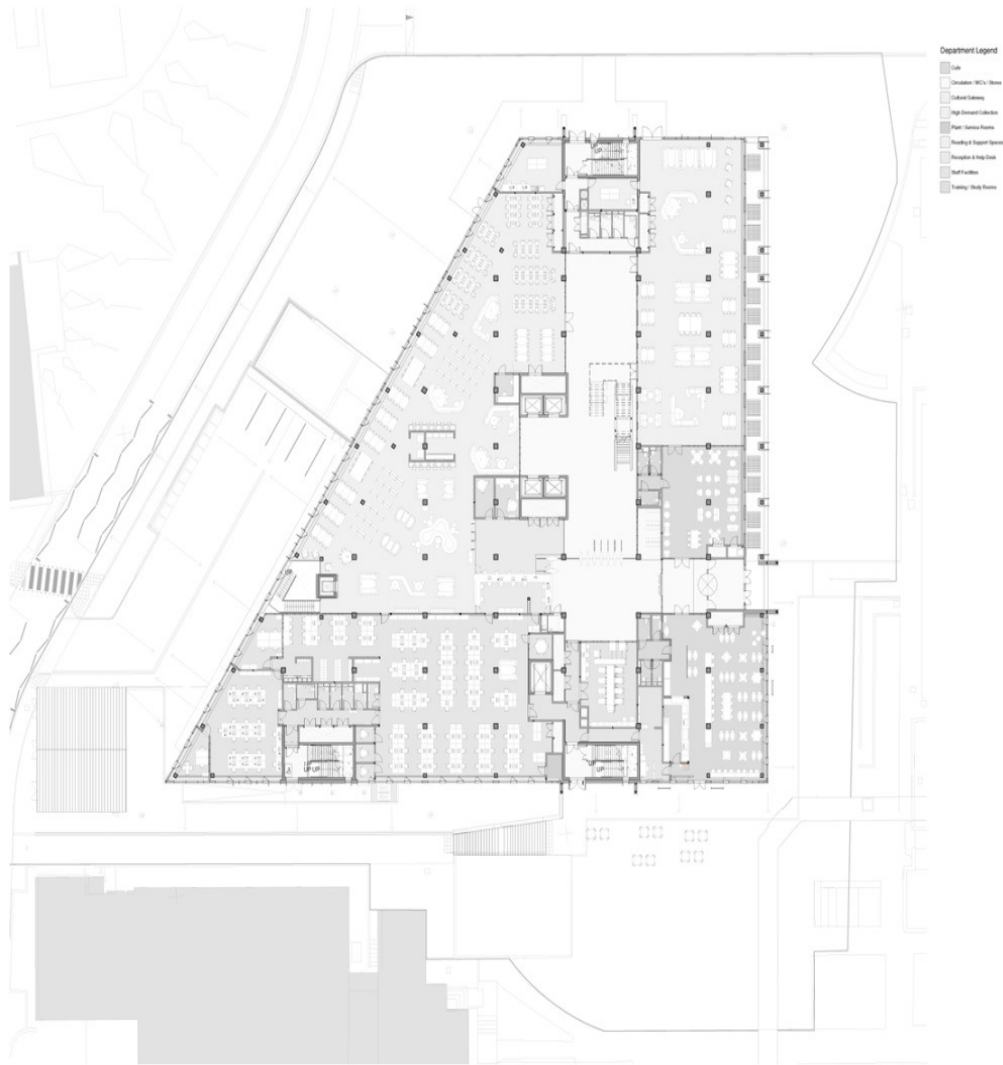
Ground floor plan of Birmingham library (image source: Archdaily)
